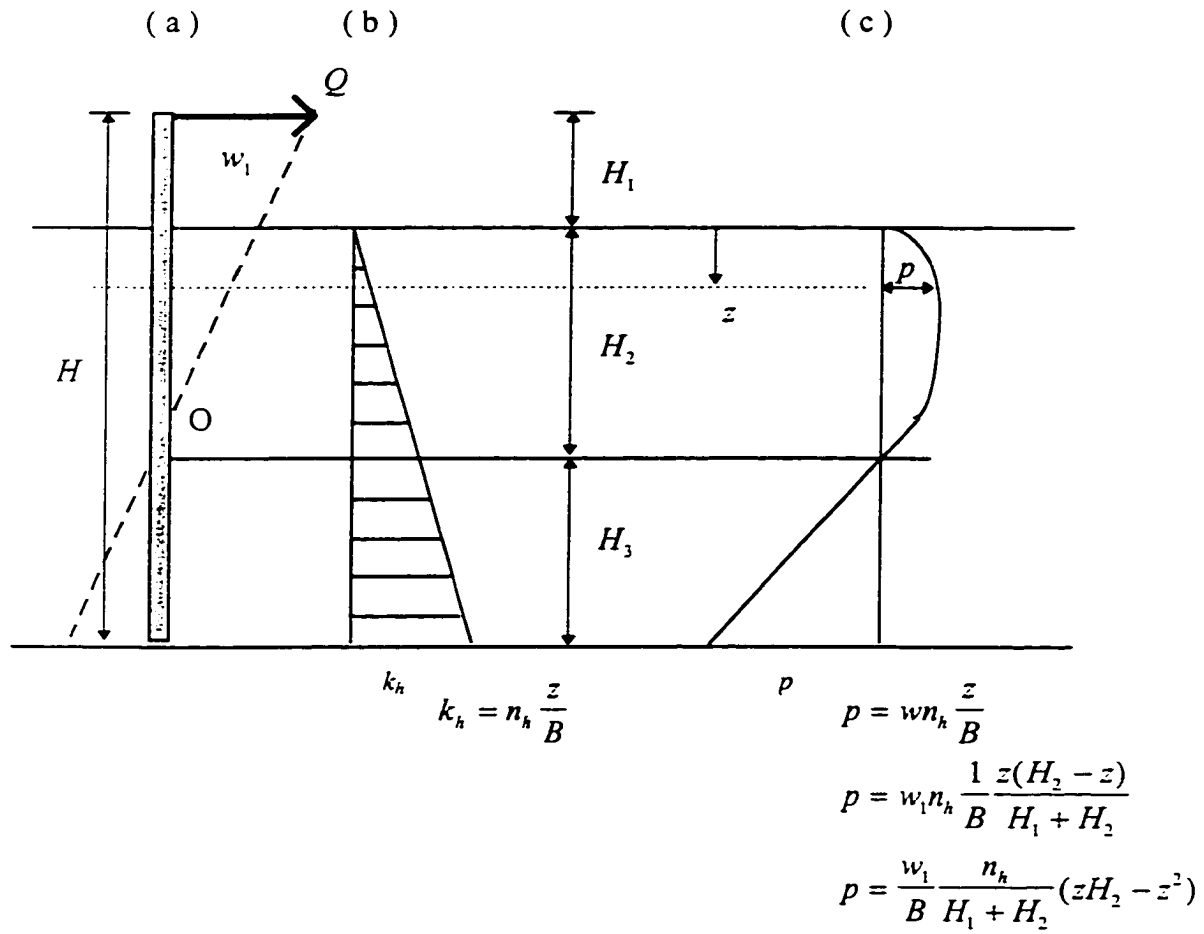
Pile Embedded in Sandy Soil Subjected to Horizontal Load
